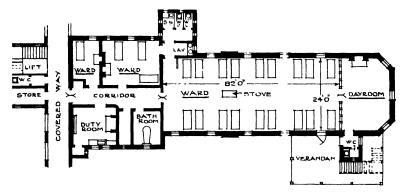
Typical plan of a Poor Law hospital pavilion block (Ministry of Health model).
